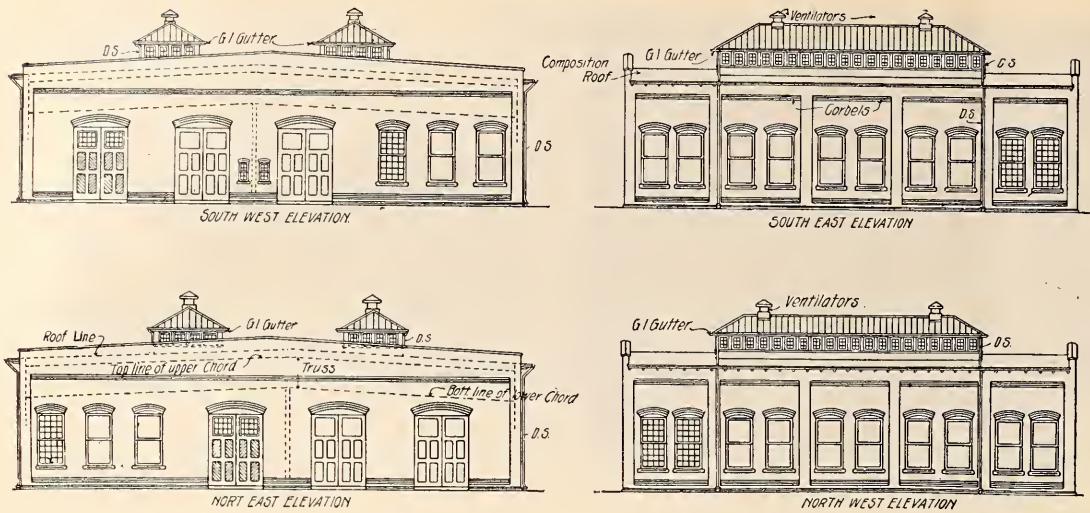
ELEVATIONS OF WOOD AND PAINT SHOP—TERMINAL R. R. OF ST. L.
